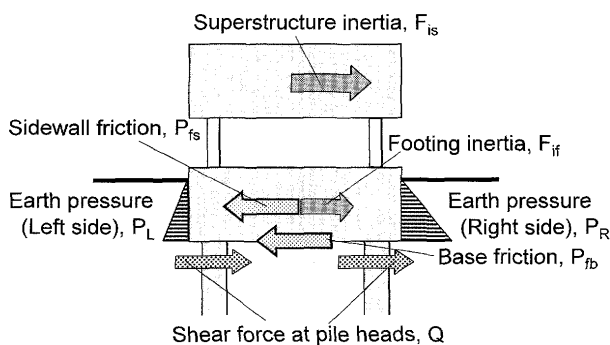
Forces acting on superstructure, embedded footing and pile heads
